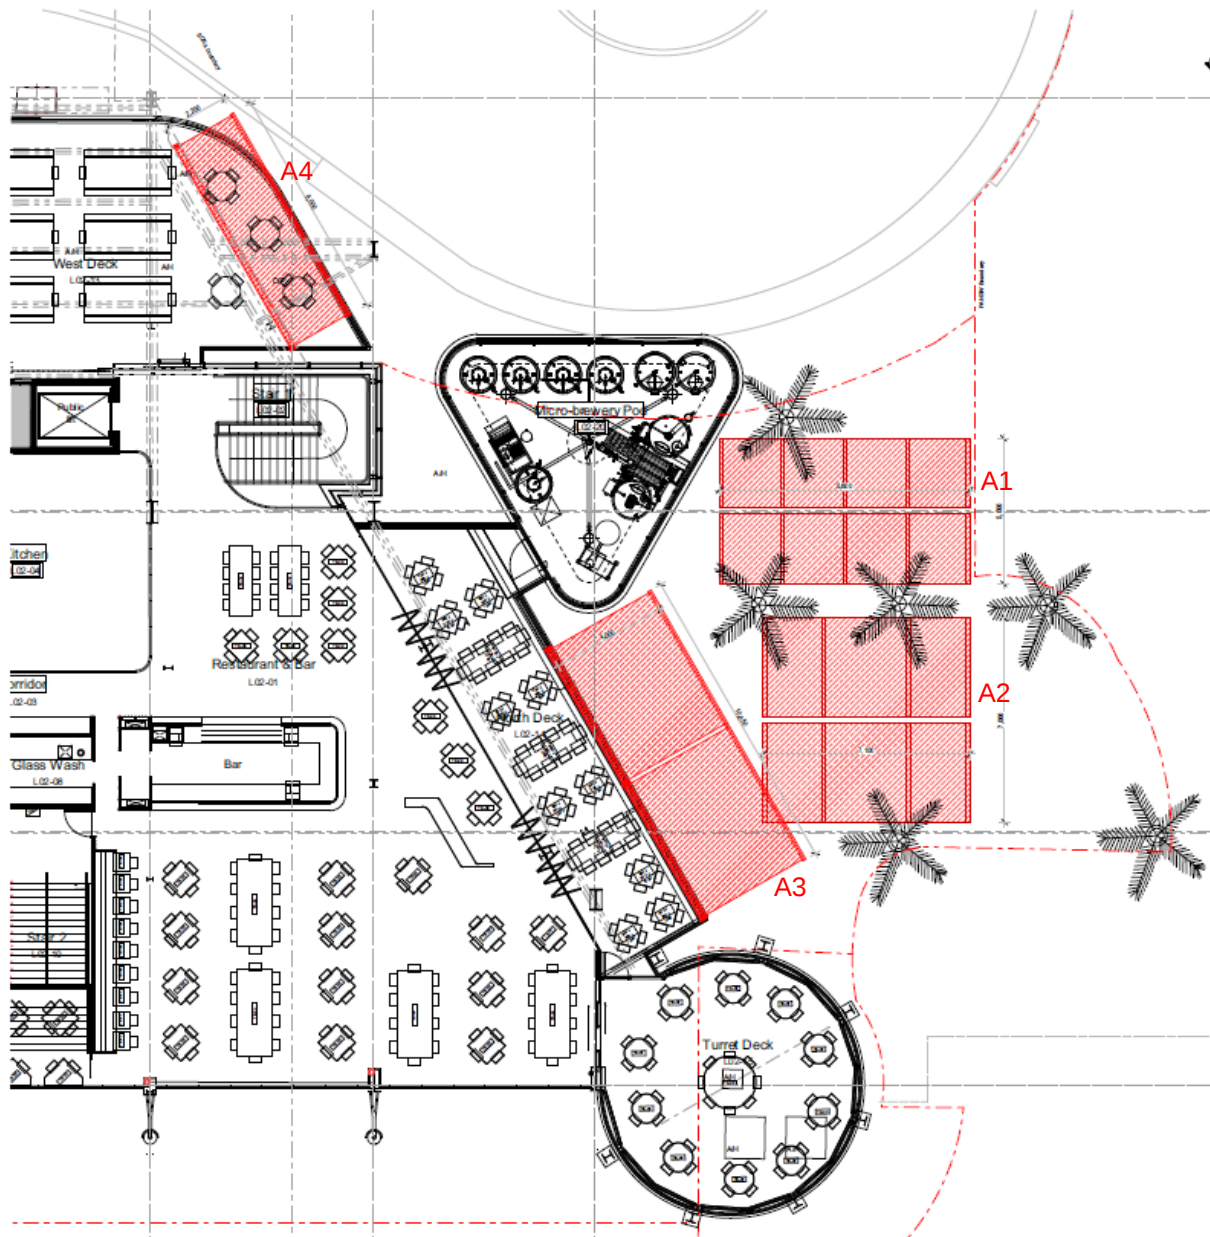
Plan of the subject site (not to scale) showing the planned form and location of the four proposed sunshading elements (shaded red and labelled A1–A4). (Source: Greenlight Design, 2018, with GML annotations)
